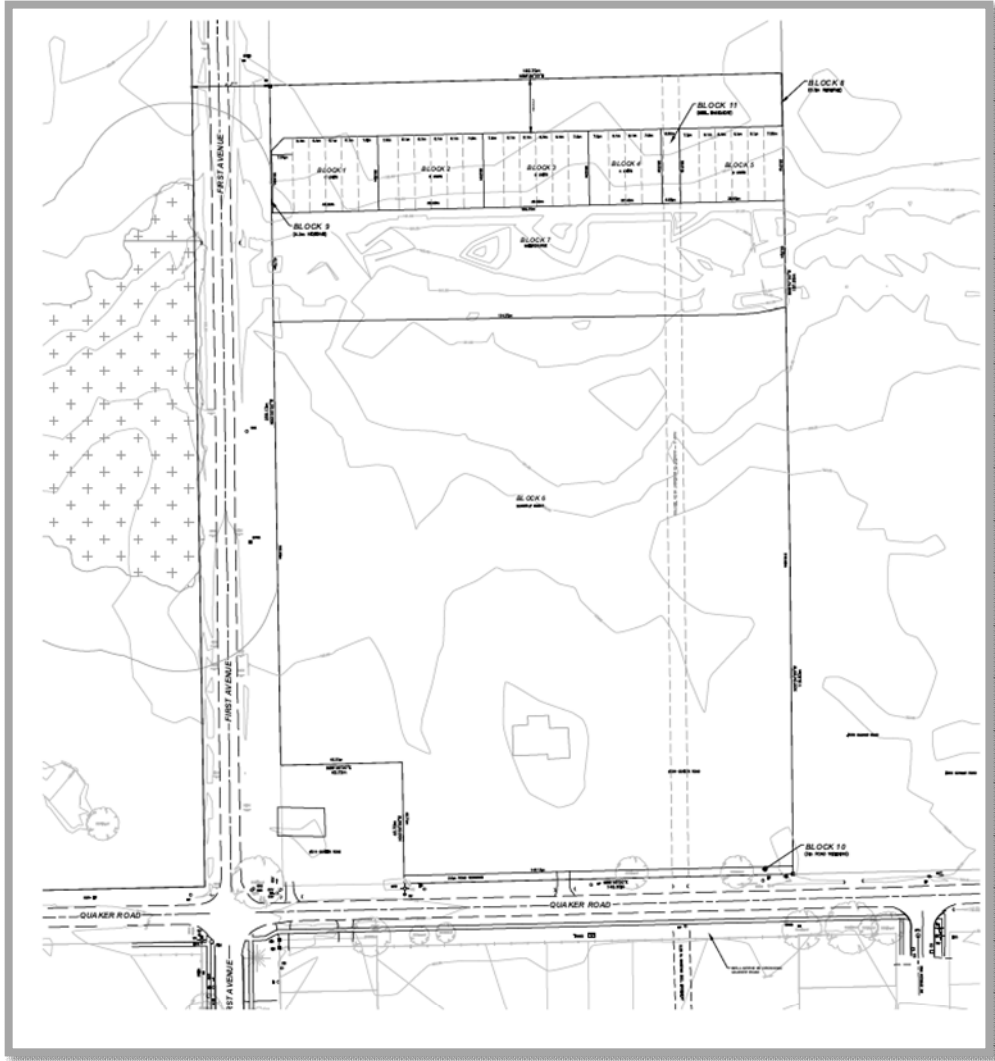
Excerpt of the proposed Draft Plan of Subdivision
